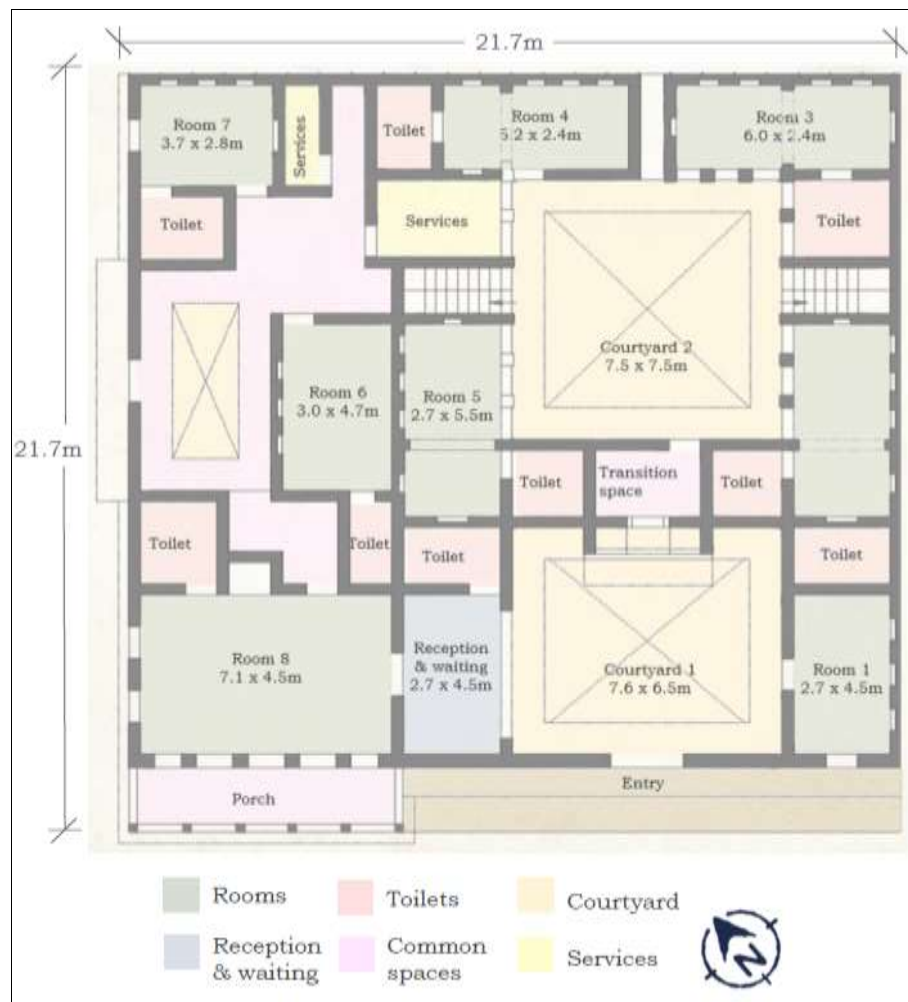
(a): Ground floor plan of the haveli-cum-hotel
